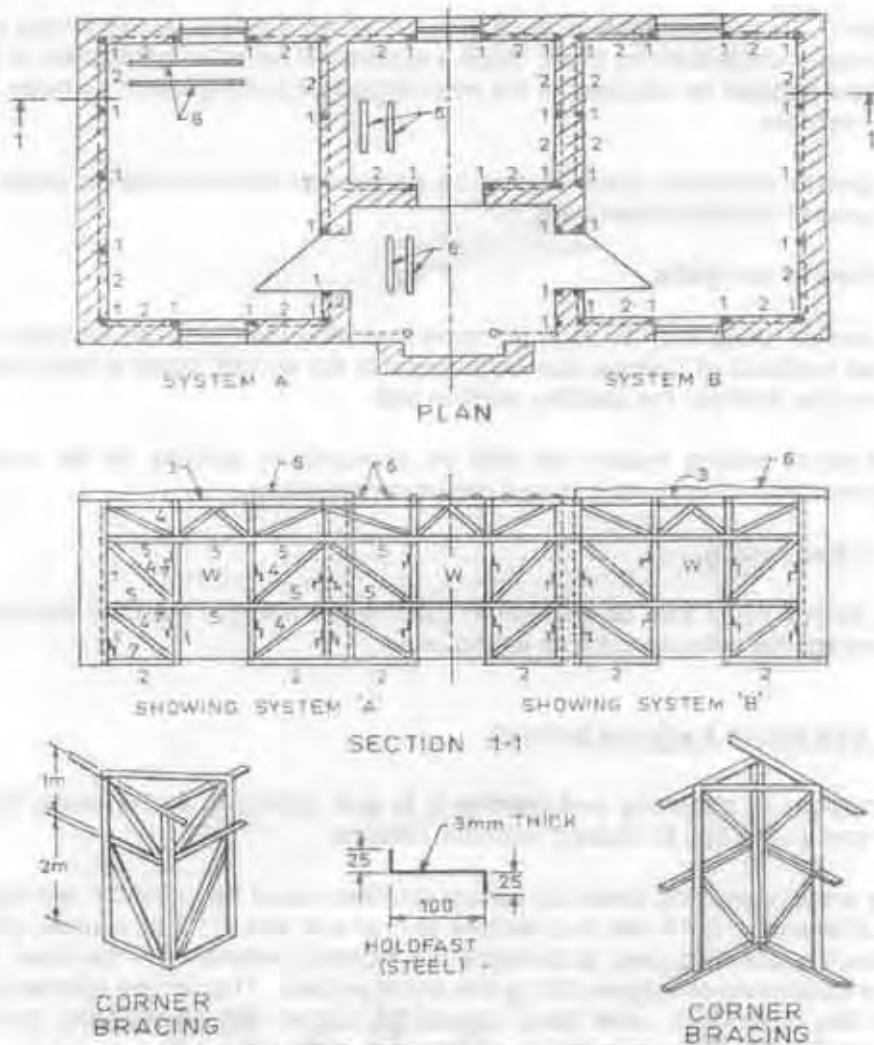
E Best Earthquake Reinforcing Arrangement for Earthen Walls
